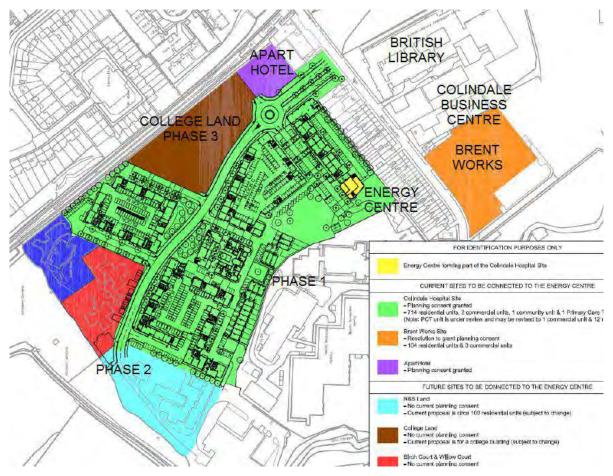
Phase Plan and Location of Energy Centre for the Colindale Hospital Site and Surrounds
